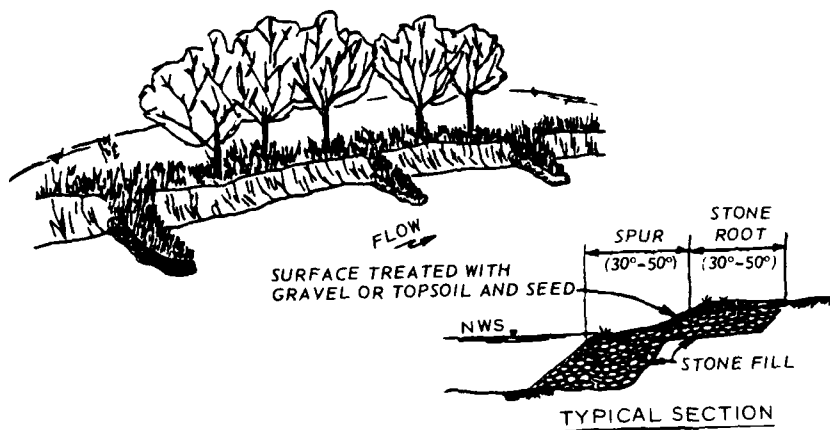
Typical bank protection schemes, reinforced revetment
